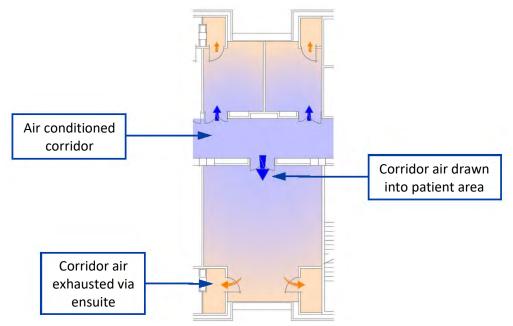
Typical Air Movement Arrangement (indirect cooling to patient rooms)
